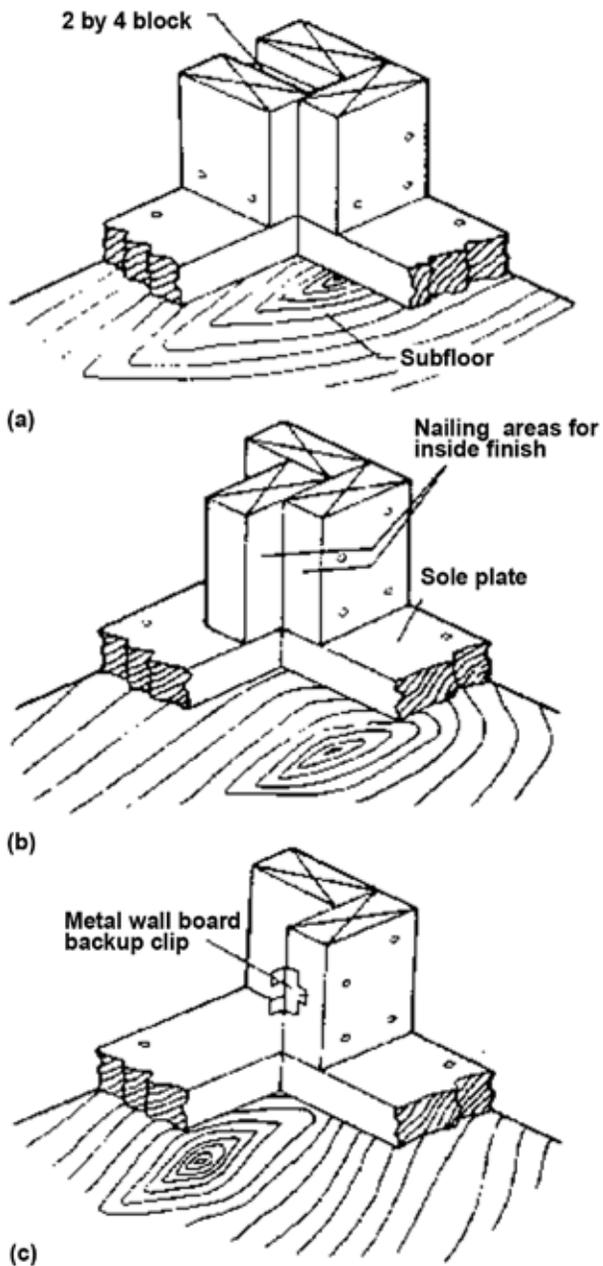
Corner details for wood stud walls that provide support for interior sheathing: (a) traditional three-stud corner with blocking; (b) three-stud corner without blocking; (c) two-stud corner with wallboard backup clips.
